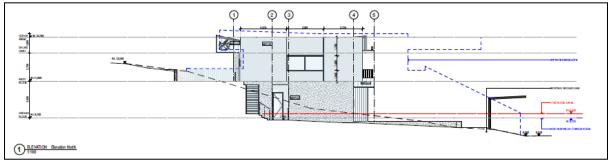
Proposed north elevation under DA-1321/2021/A which show the outline of the approved built form (in blue dotted line).
